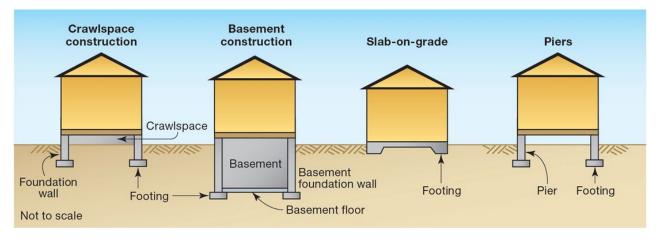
The four foundation types represented in this figure are crawlspace, basement construction, slab-on-grade and piers.
